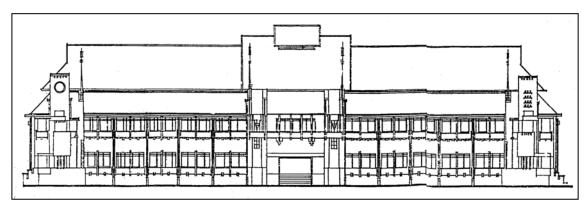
Town Hall in Ketabang: elevation of the front gable.
